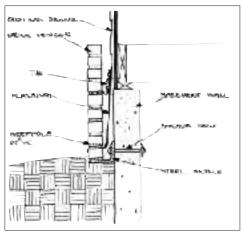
When adding brick veneer to an existing building, the angle of the support shelf and the number of bolts tying it to the building must be figured by an engineer.
